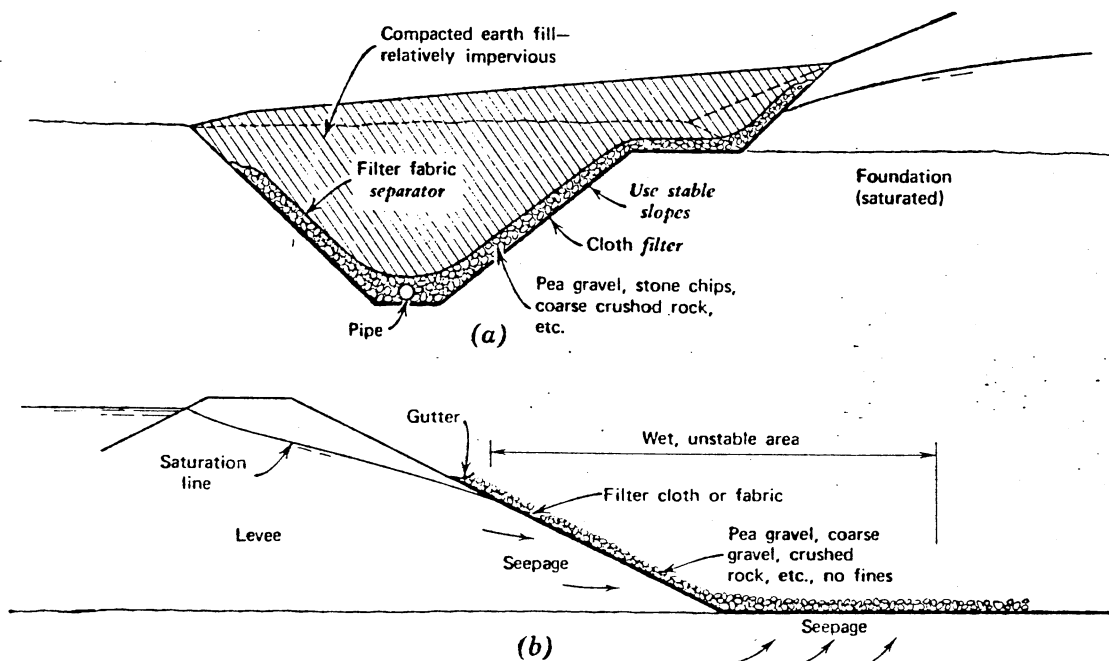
Illustration of two potential uses for fabrics in drains for dams and levees. (a) A toe drain controlling seepage through dam and foundation, (b) A temporary measure for preventing imminent failure. (After Fig. 5.16 of "Seepage, Drainage, and Flow Nets," 2nd Ed., H. R. Cedergren, Copyright © 1977, John Wiley & Sons, Inc. N. Y. Reprinted by permission of John Wiley & Sons, Inc.)
